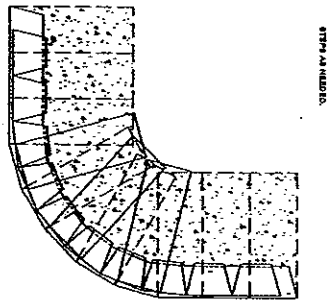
ALL REINFORCEMENT TO LIE IN OR TO OVERLAP TOP OF SOIL BETWEEN THE REINFORCEMENT LAYERS. 3" TO 1
